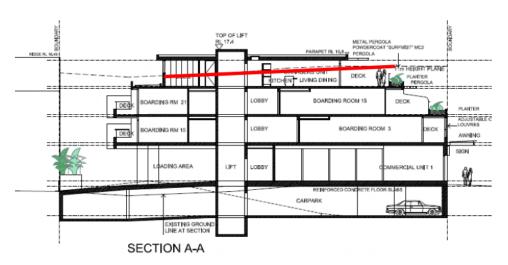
Plan (section A-A) extract showing extent of 11 metre building height breach
